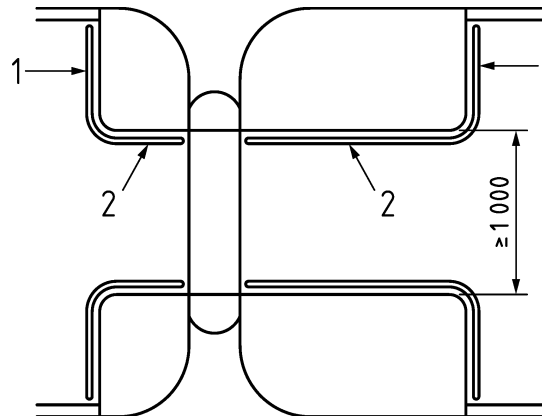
Example of handrails in and adjacent to narrow gangways
